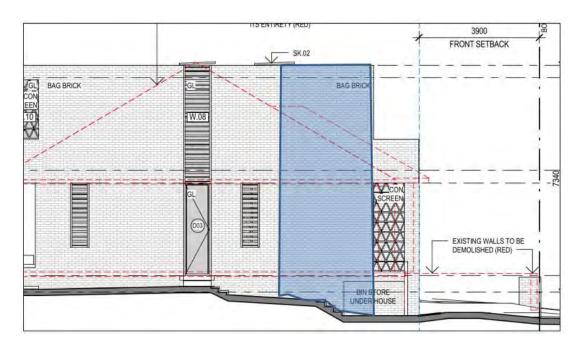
Extract from the architectural plans (western elevation), shows the approximate extent of non-compliance with the building height for flat roof dwellings.
